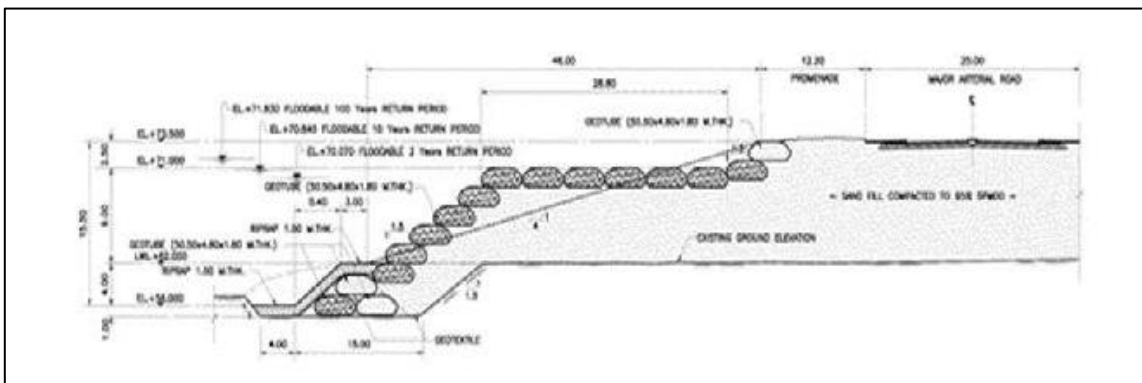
Section of Waterfront (riprap geotube + geotube) Alternative 6
